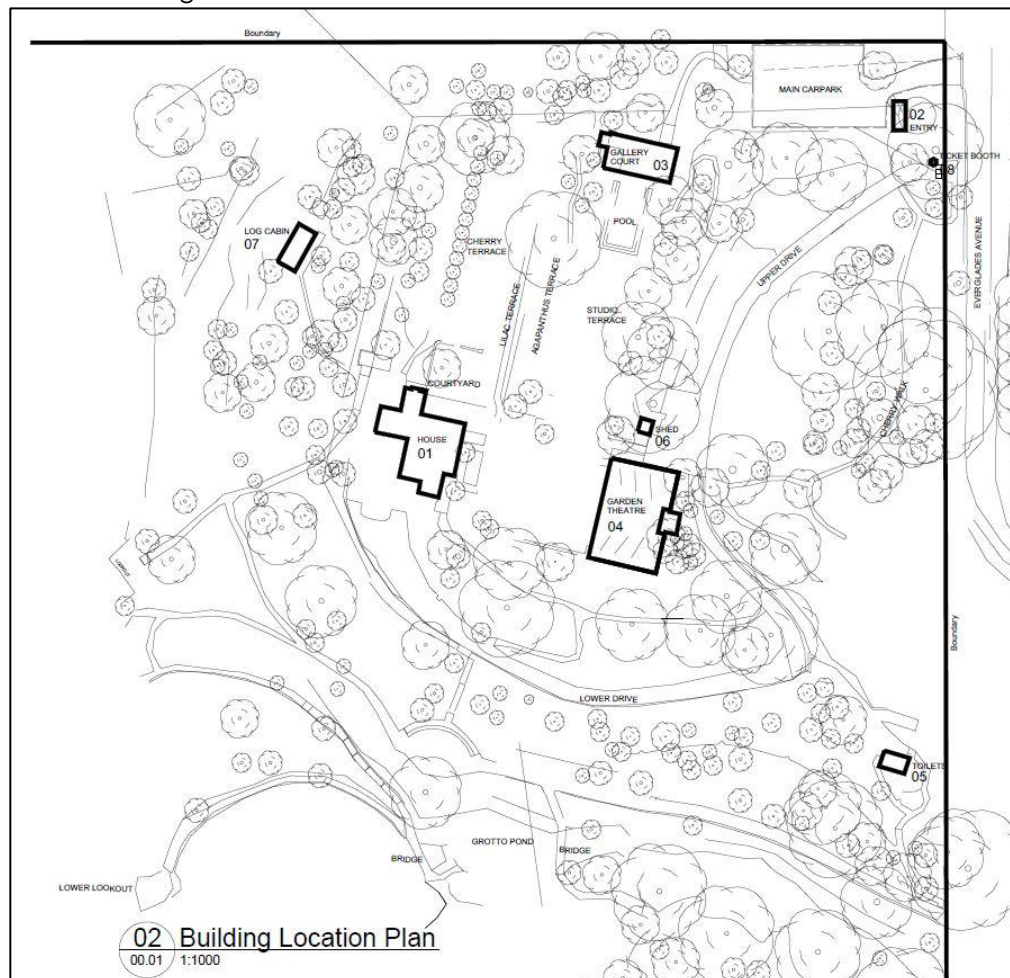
Everglades House & Gardens site plan 2022 (source National Trust of Australia (NSW) Heritage Impact Statement 2024
